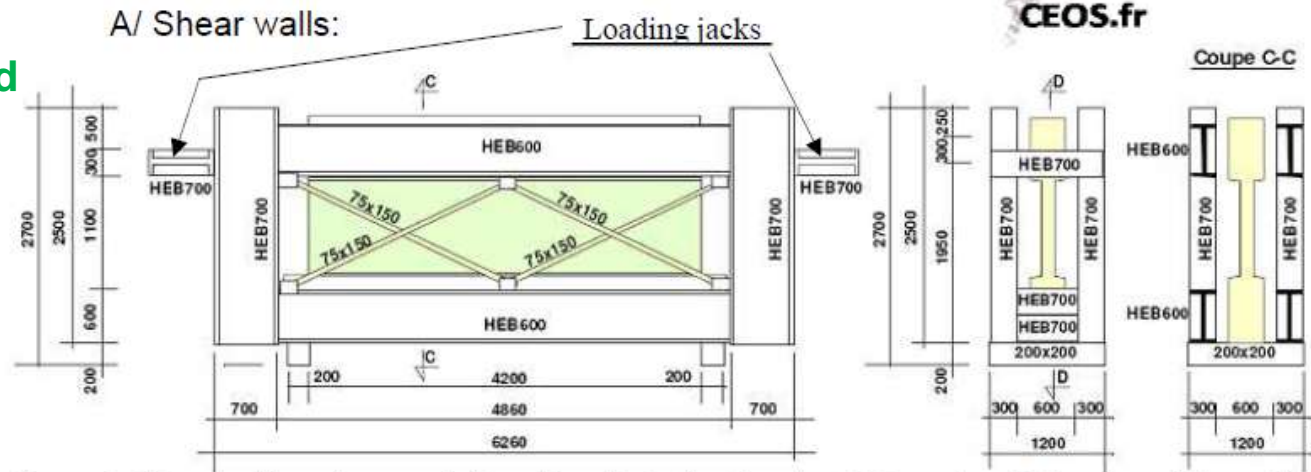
Shear wall specimens – left: wall on its testing bench- right: sectional elevation of the wall
